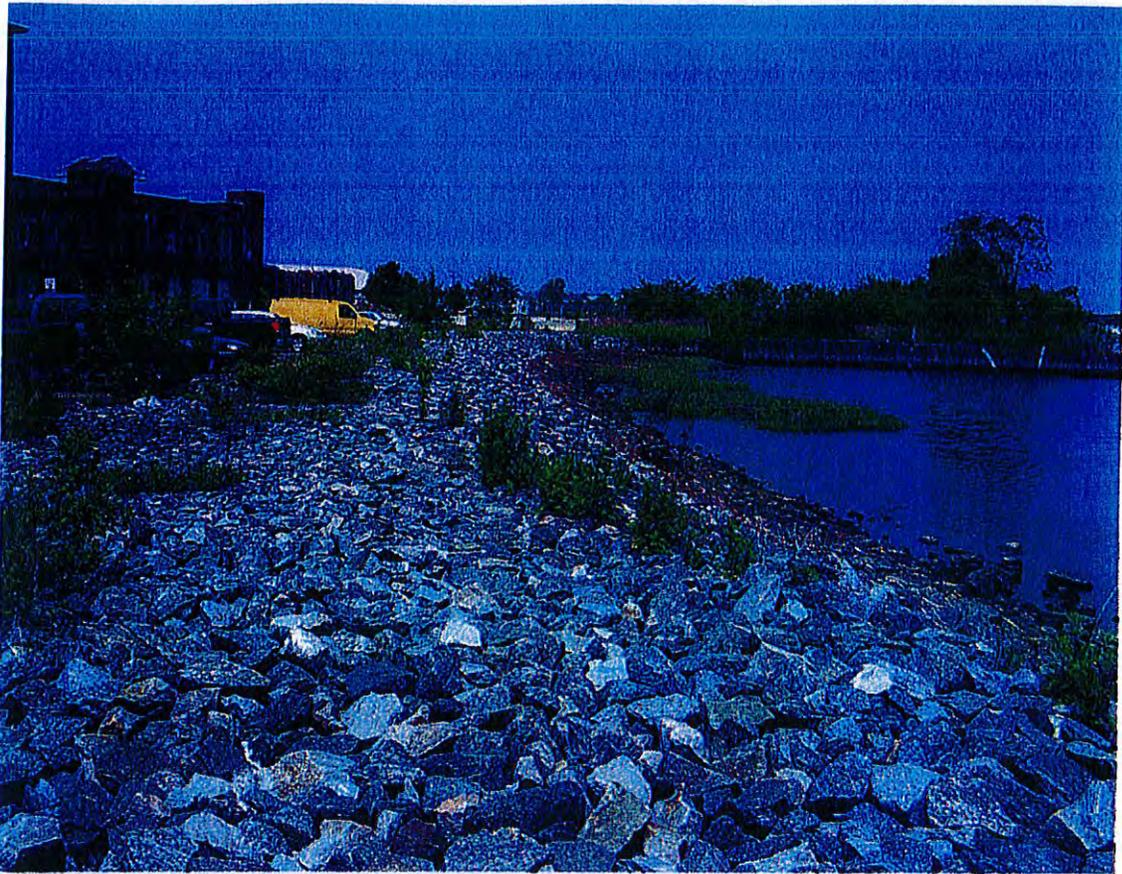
Riprap Coastal Bank at Sawyer Street Outfall
